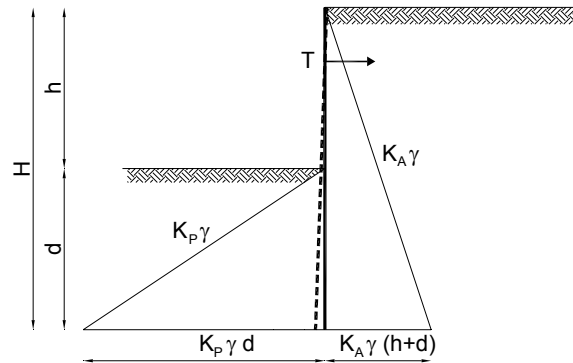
General layout and limit earth pressure distributions for anchored sheet pile wall.
